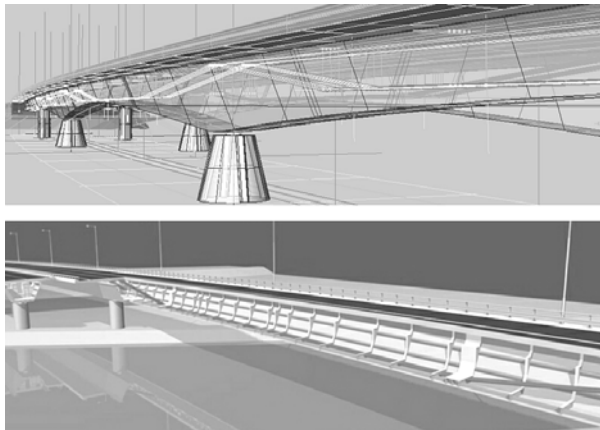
Longitudinal prestressing of composite girder [4, 5]
